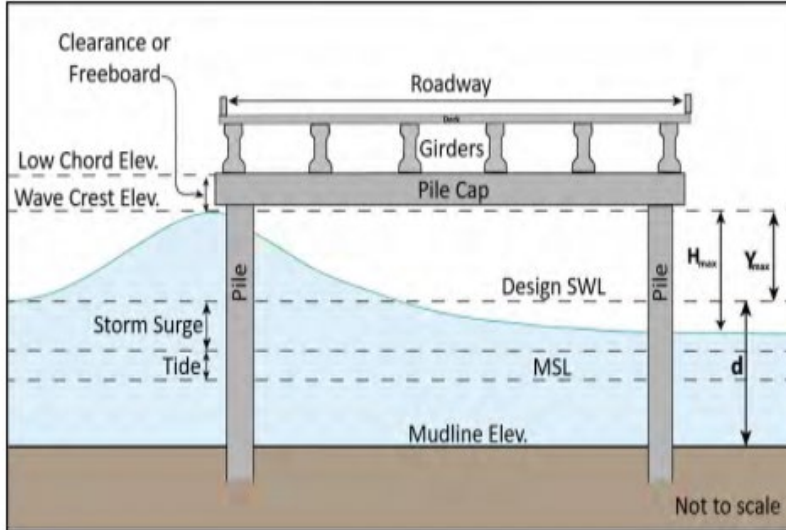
Definition sketch of wave parameters and water levels for determining elevation of bridge deck for clearance from wave crests
